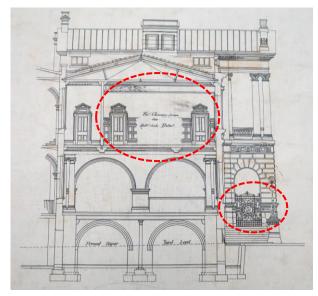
Section E-F (generally as constructed) showing view north, through the centre of the Link Building (features visible include detail of plaster frieze, timber panelling and carved door pediments in the Premier's Room on the first floor, and wrought iron gates to portico – now removed)
